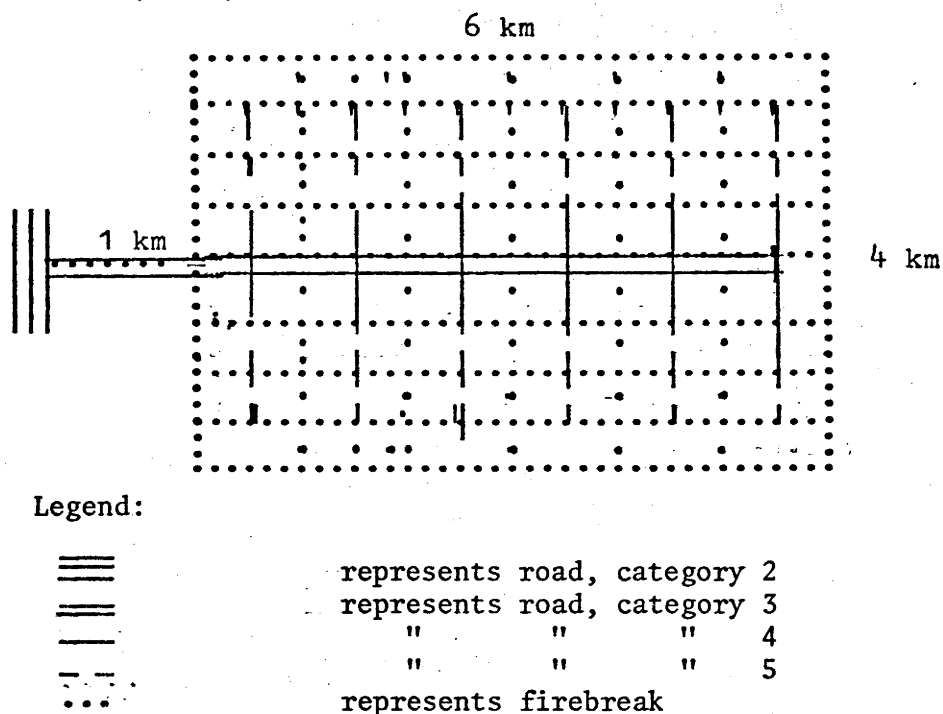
MODEL PLAN OF A PLANTATION UNIT
